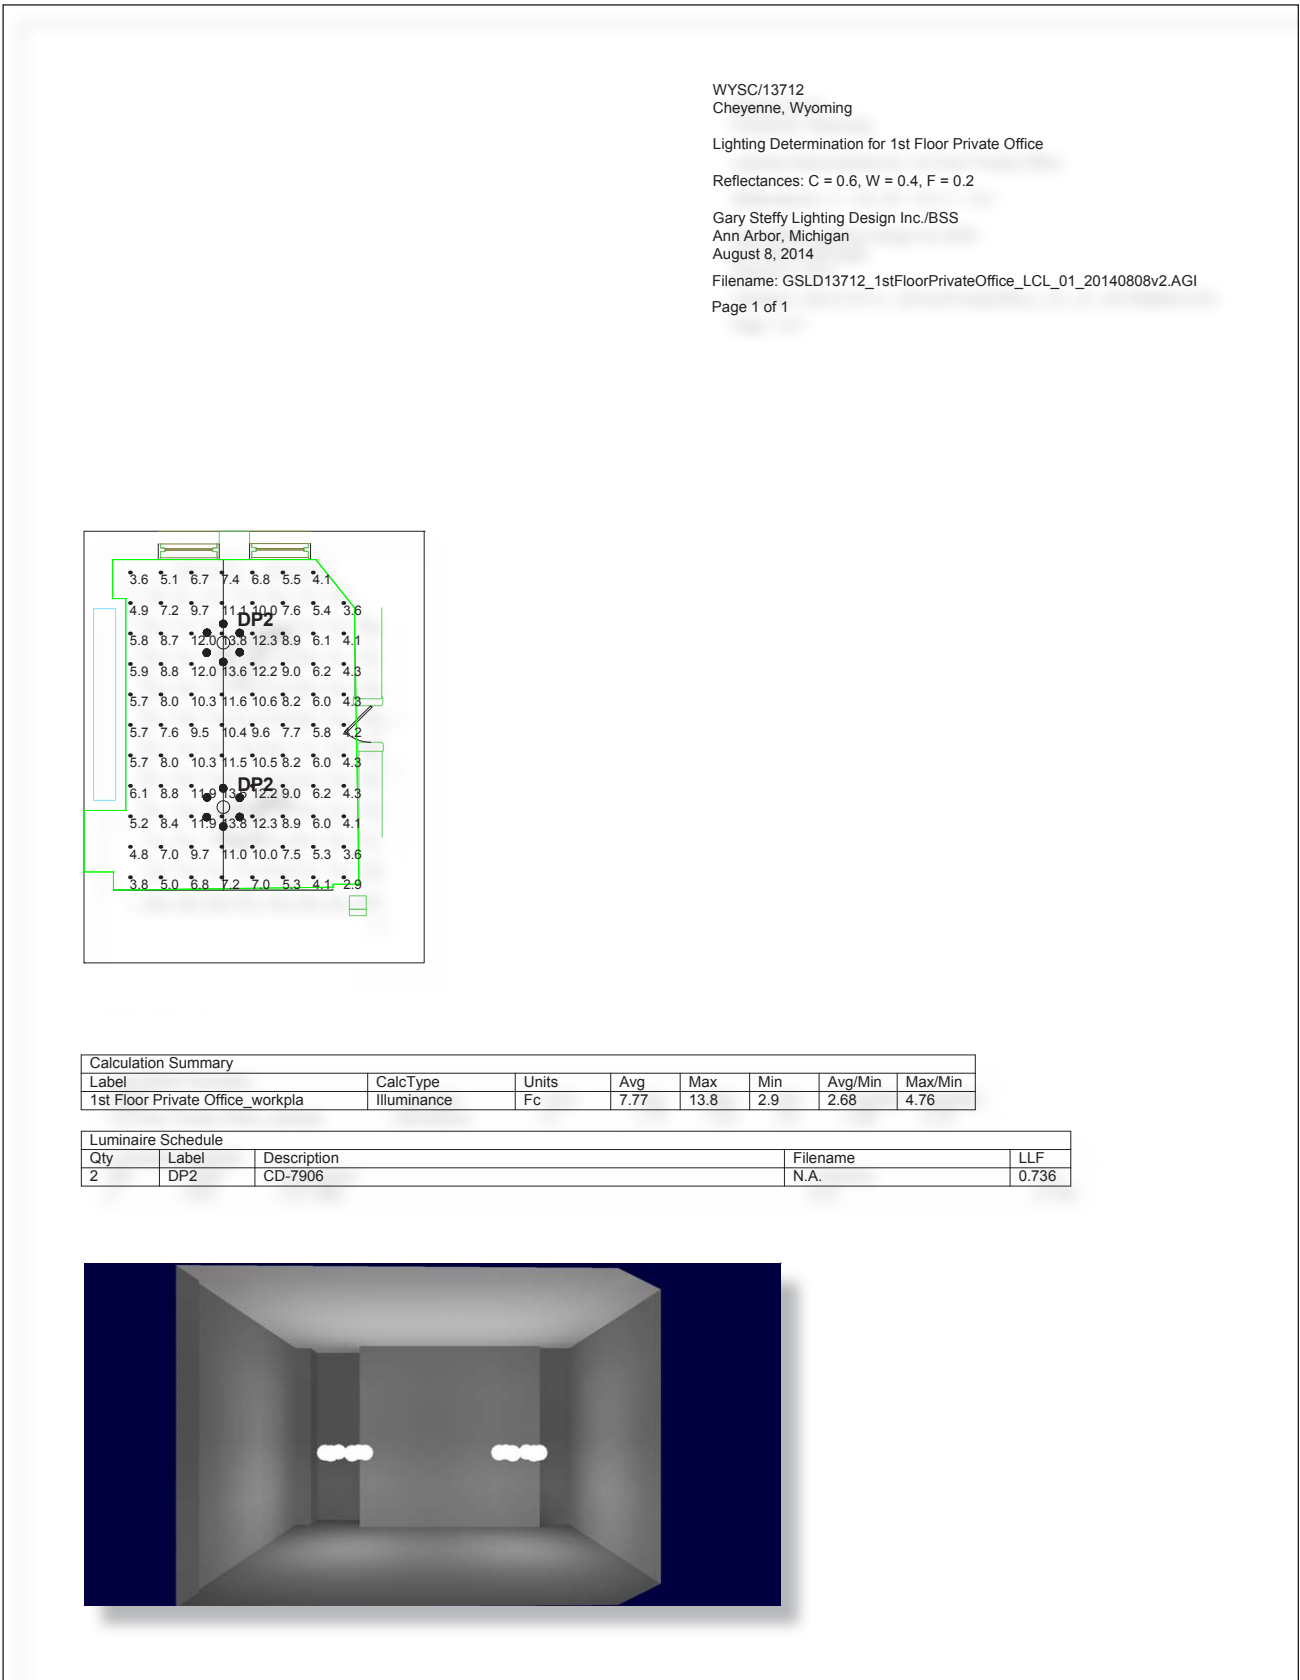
Lighting Calculation: First Floor Private Office
